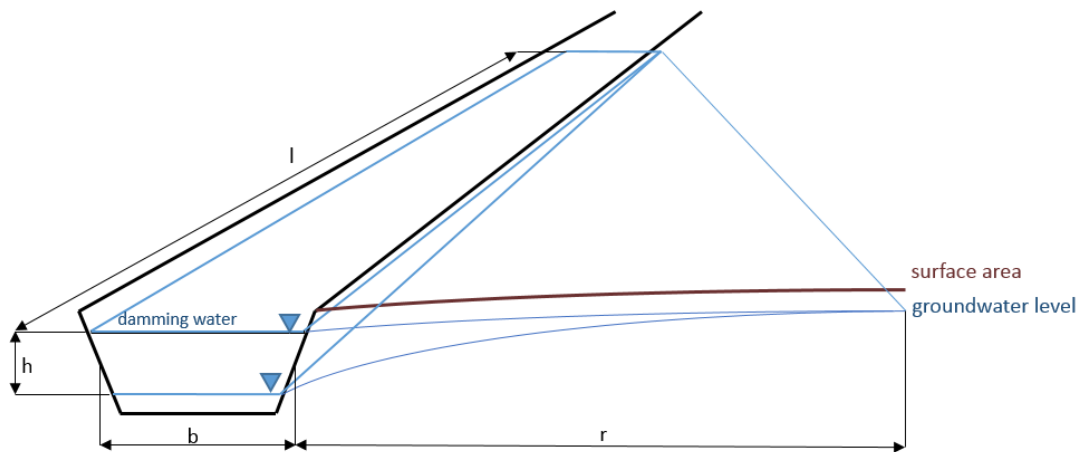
Pictorial drawing of water conditions for damming the trenches/ditches
